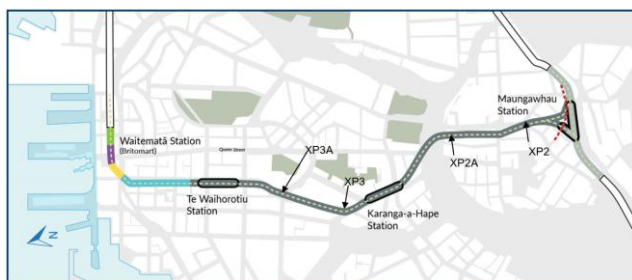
City Rail Link Contract C3 Alignment and Station Location Plan
